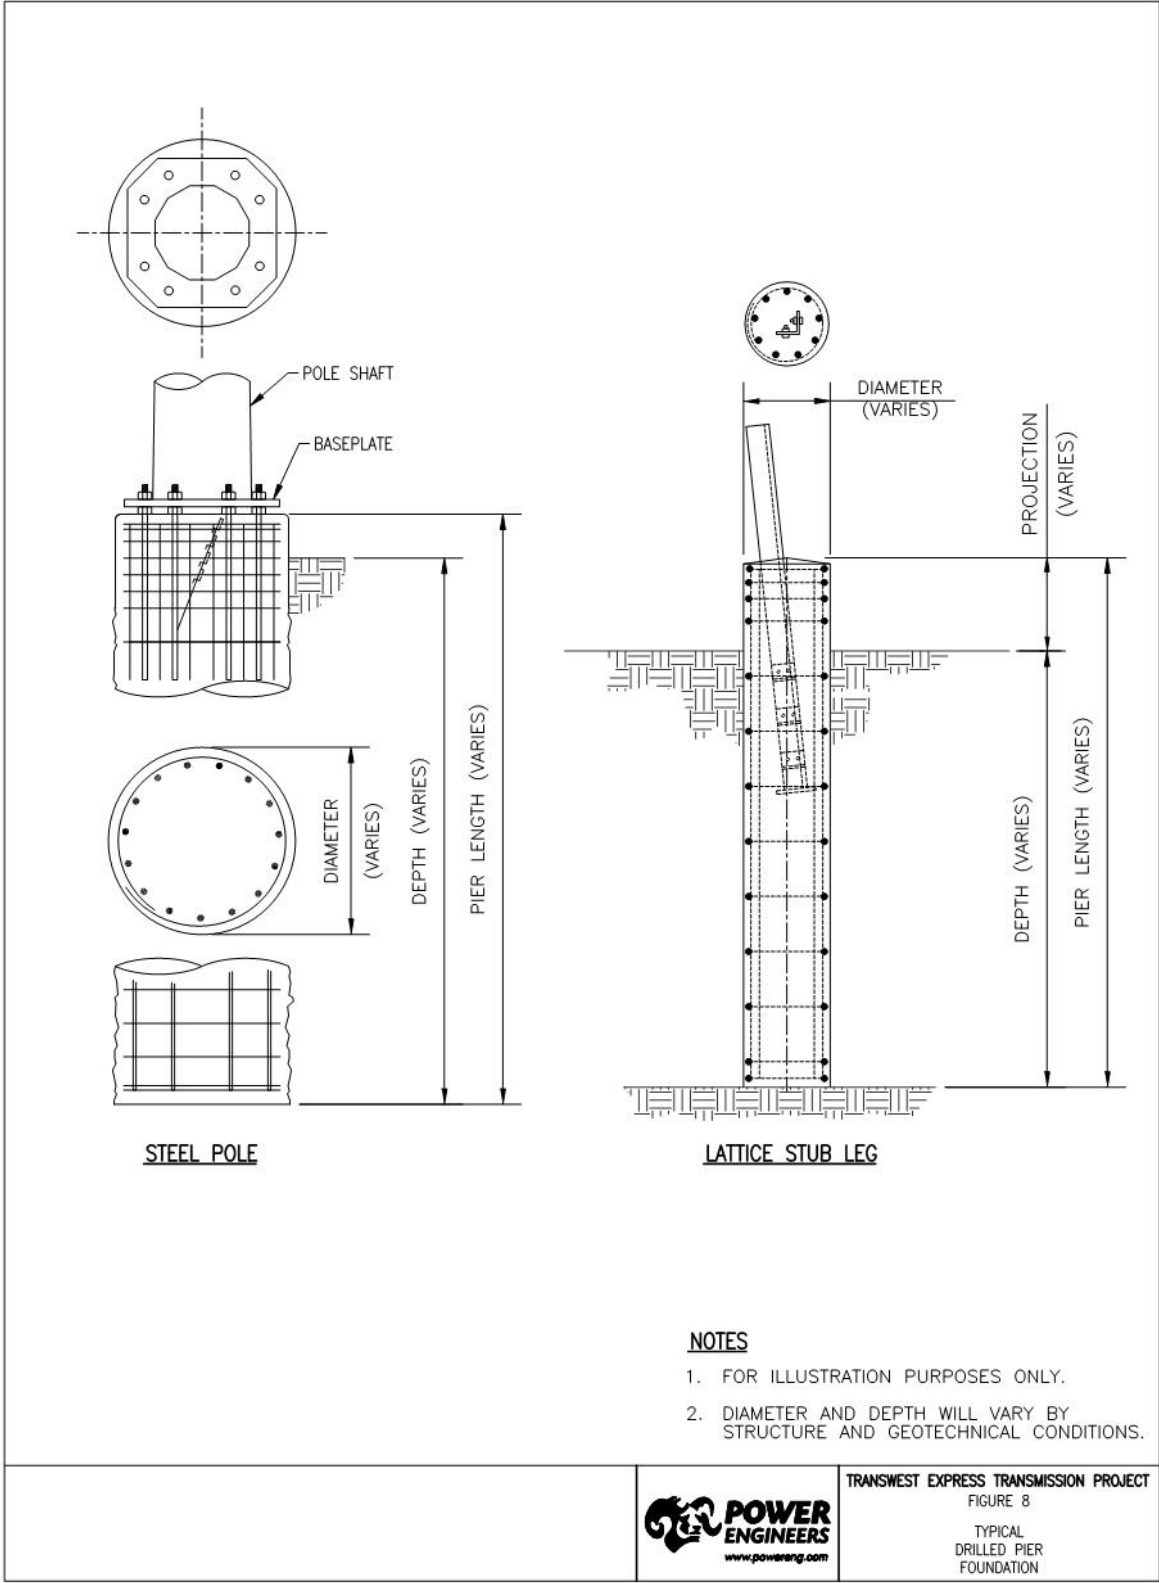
TYPICAL DRILLED PIER FOUNDATION
